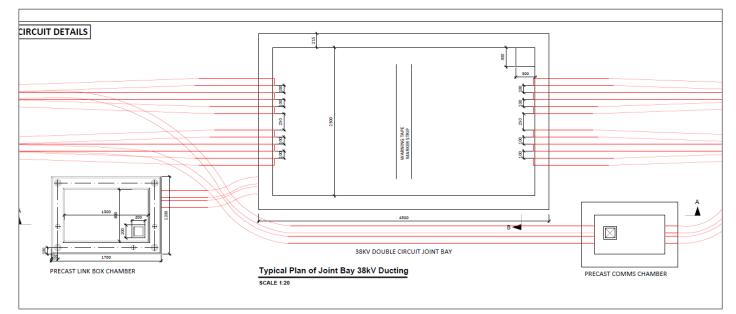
Proposed 38kV Double Circuit Joint Bay and Link Box Plan Details
